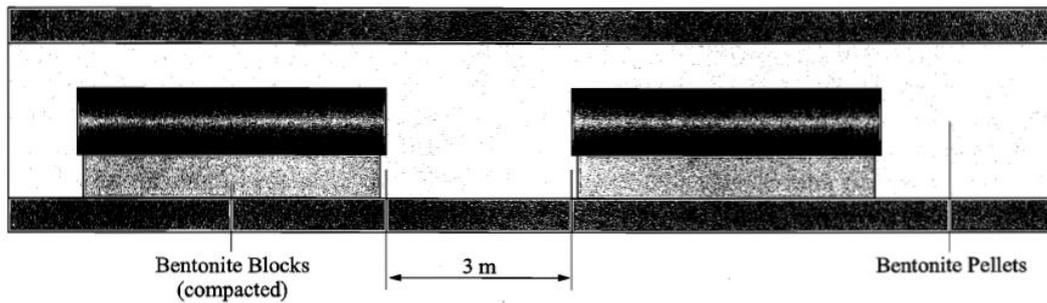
Longitudinal section of emplacement tunnels for HLW and SF
